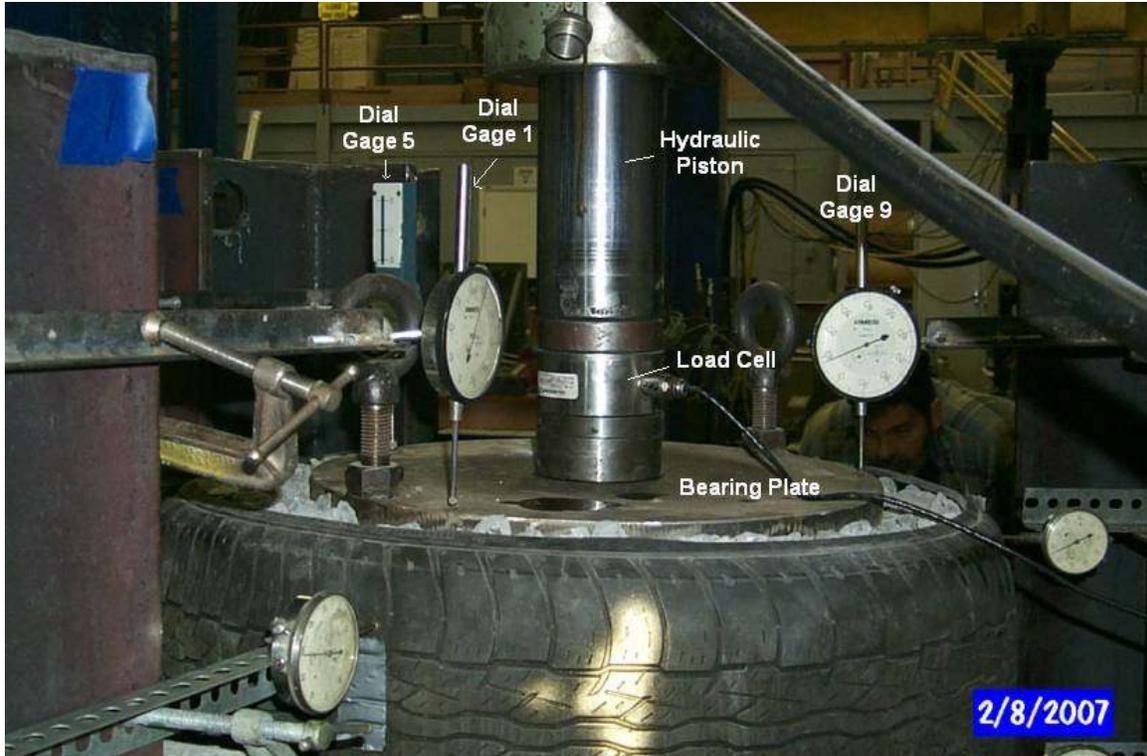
View of Testing Equipment and Instrumentation at Top of Tire Column
